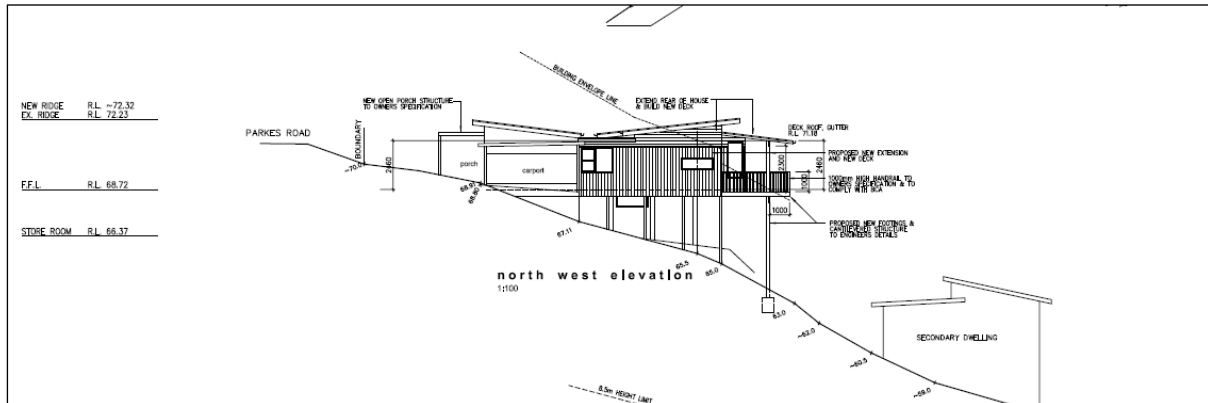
North West Elevation (Source: Anna Henry AH Design)
